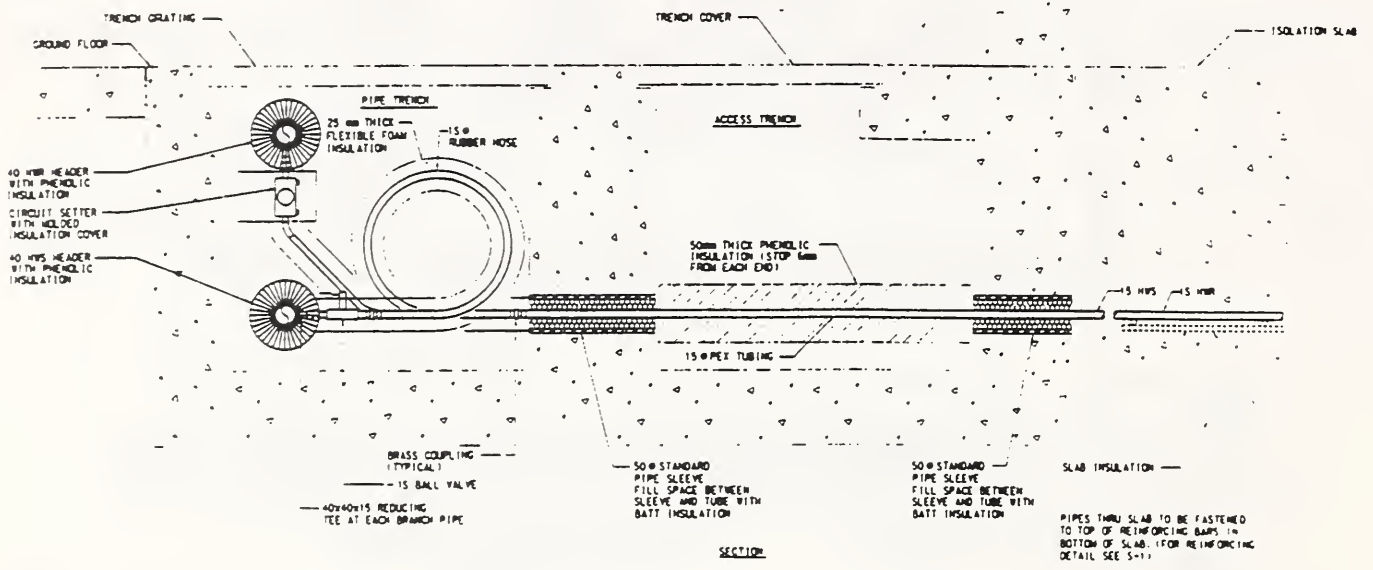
Piping Detail for Isolation Slab next to Mechanical Trench
